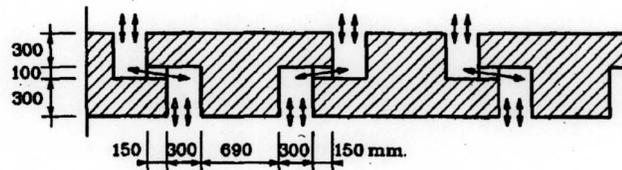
Longitudinal cross-section of floor of Krammer locks (Rijkswaterstaat, 2000).
